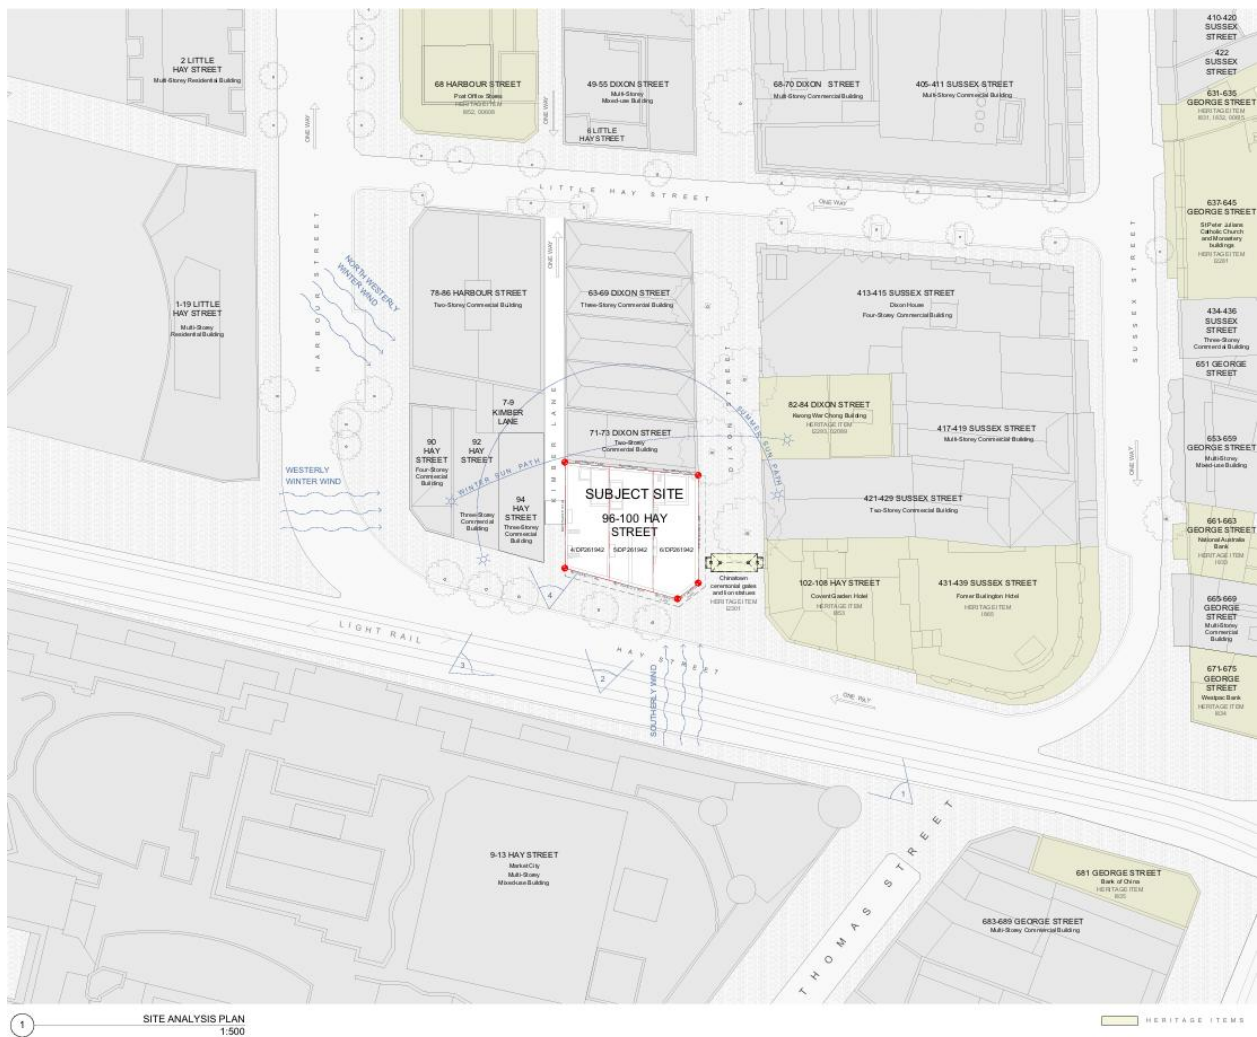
Extract of Site Analysis Plan (Source: Candalepas Associates)
